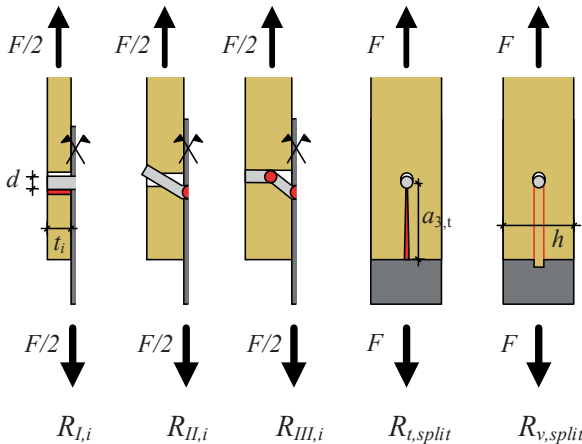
Simplification of failure modes of the EYM for the symmetric half of a dowelled timber-steel-timber connection and splitting and block shear failure modes.
